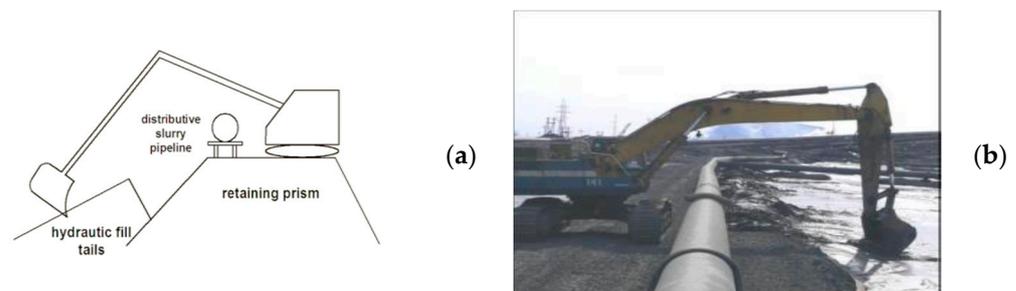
Arrangement of a secondary banking dam of hydraulic fill tails with the help of excavating equipment: (a) elementary diagram of arrangement; (b) in situ tests.
